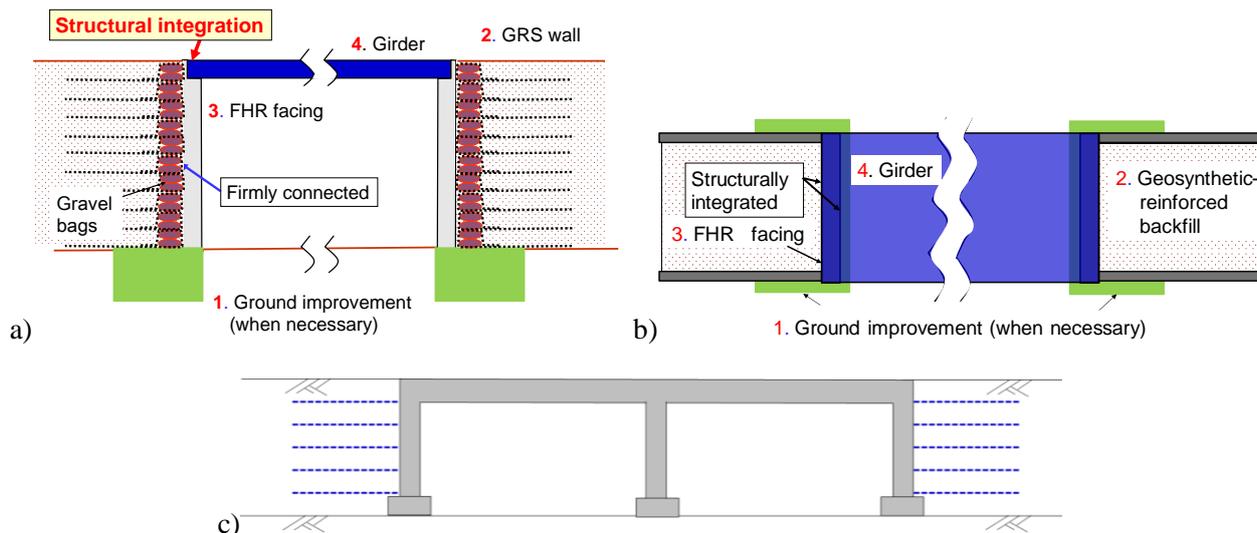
GRS Integral Bridge: a) elevation; b) plan; and c) a long-span girder vertically supported by a pier at its center (Tatsuoka et al., 2009, 2014, 2015, 2016).
